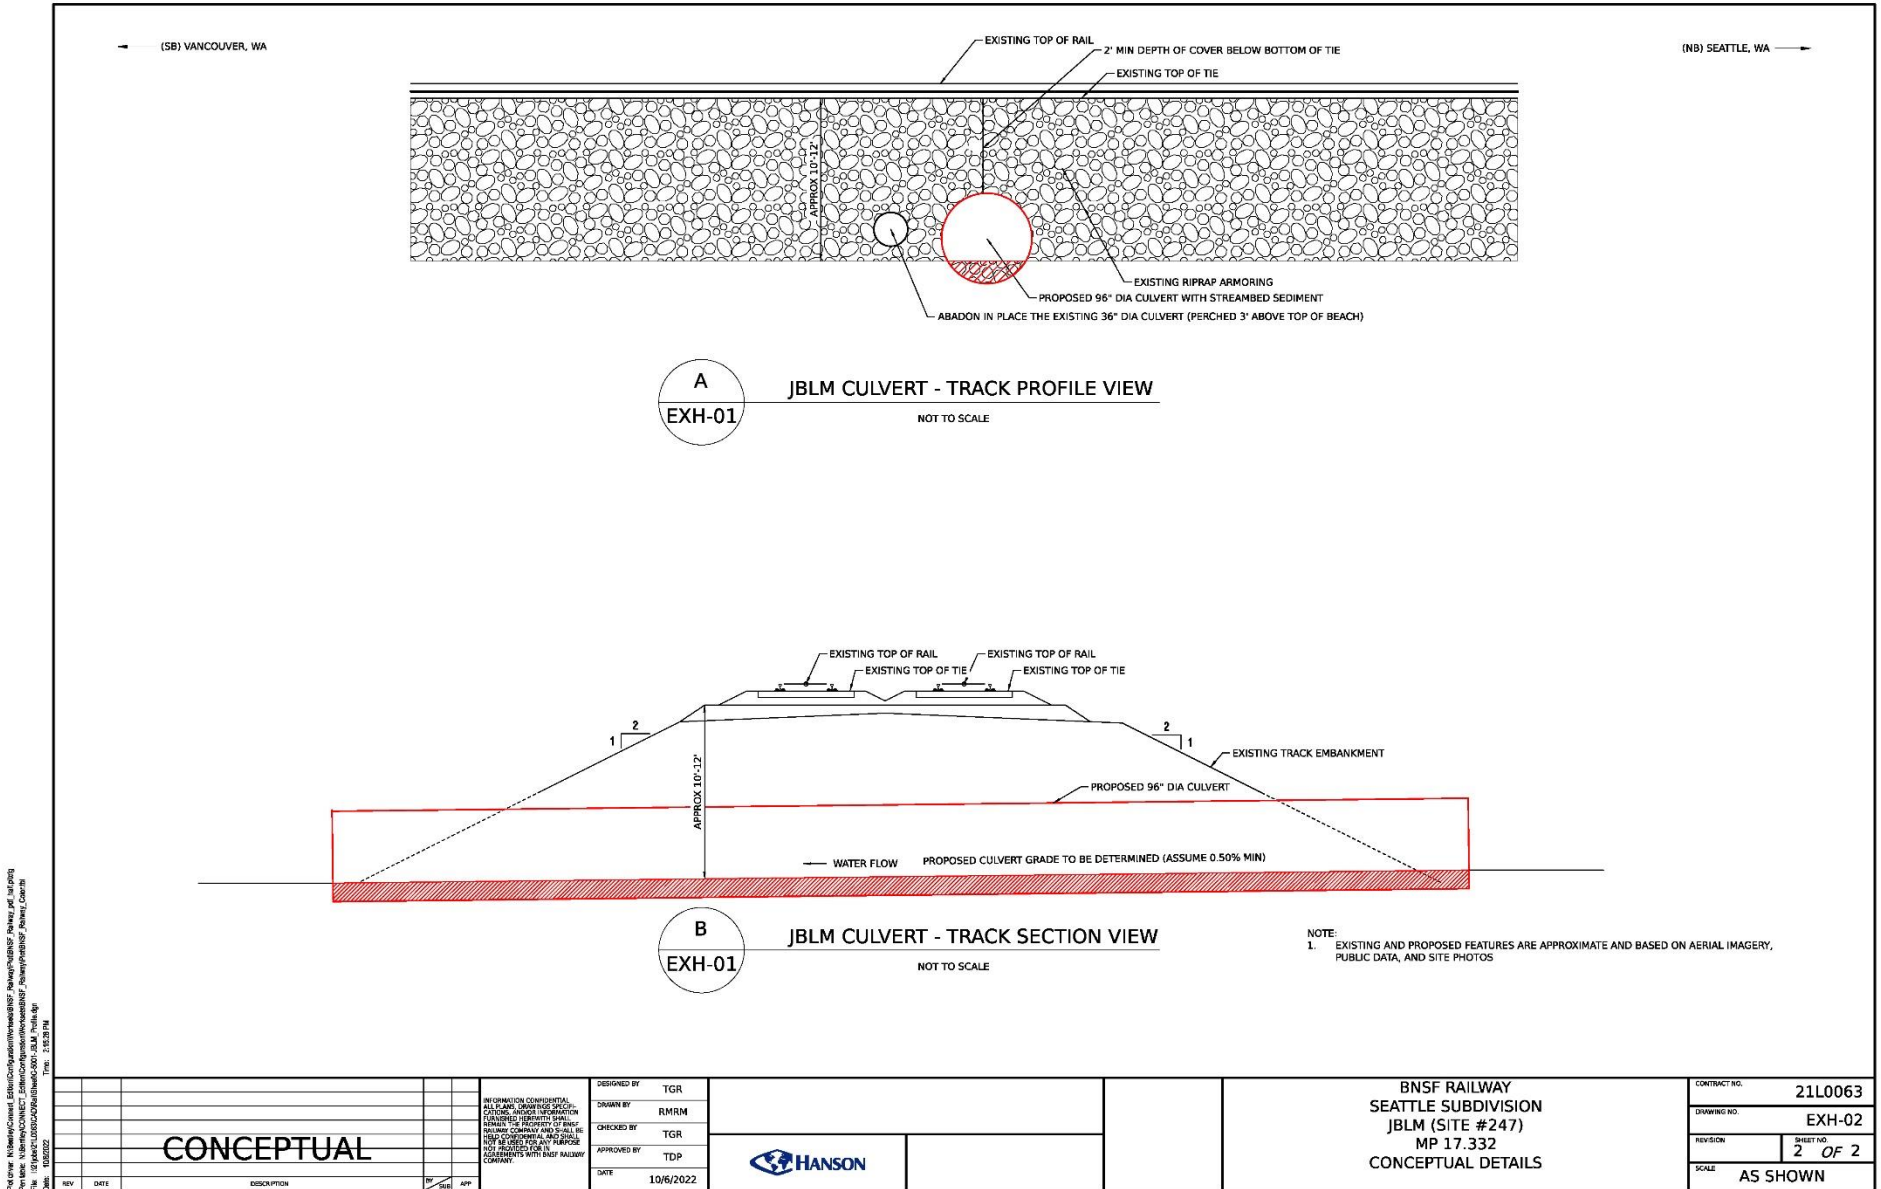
Conceptual Engineering Profile and Section of Replacement Culvert Under Railroad Tracks at Unnamed Creek on JBLM
